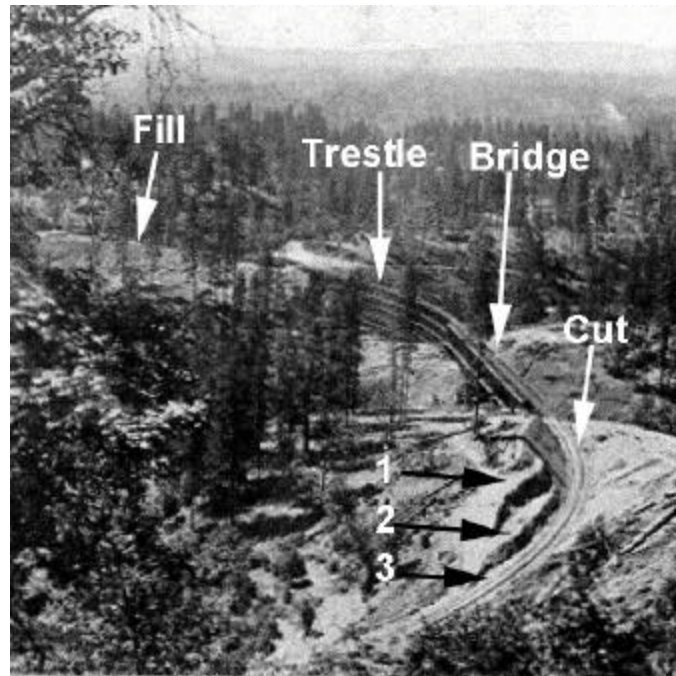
Choosing the best elevation for crossing Long Ravine Gap required compromising on the fill/trestle/bridge/cut as shown. The three cart roads that were used in 1865 are visible in the cut.
